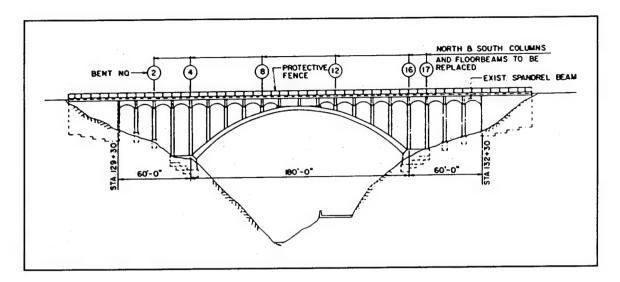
North elevation of Fremont Street Bridge (from Smyers 1984)
